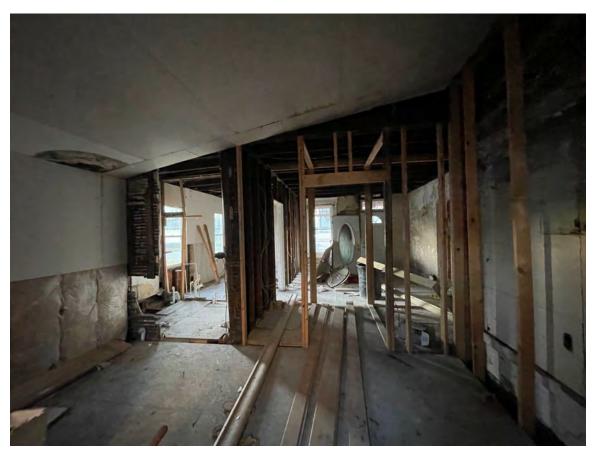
Photo of the interior damage to the addition proposed to be fully demolished.
